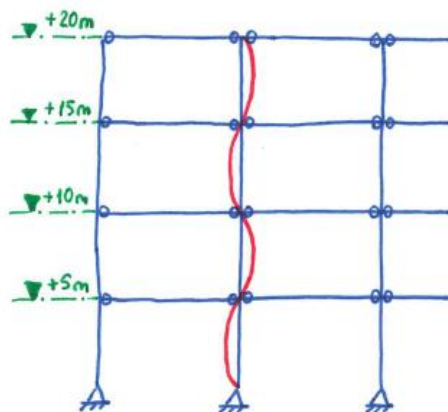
Deformation and bucking lengths in the calculation of the column profile.
